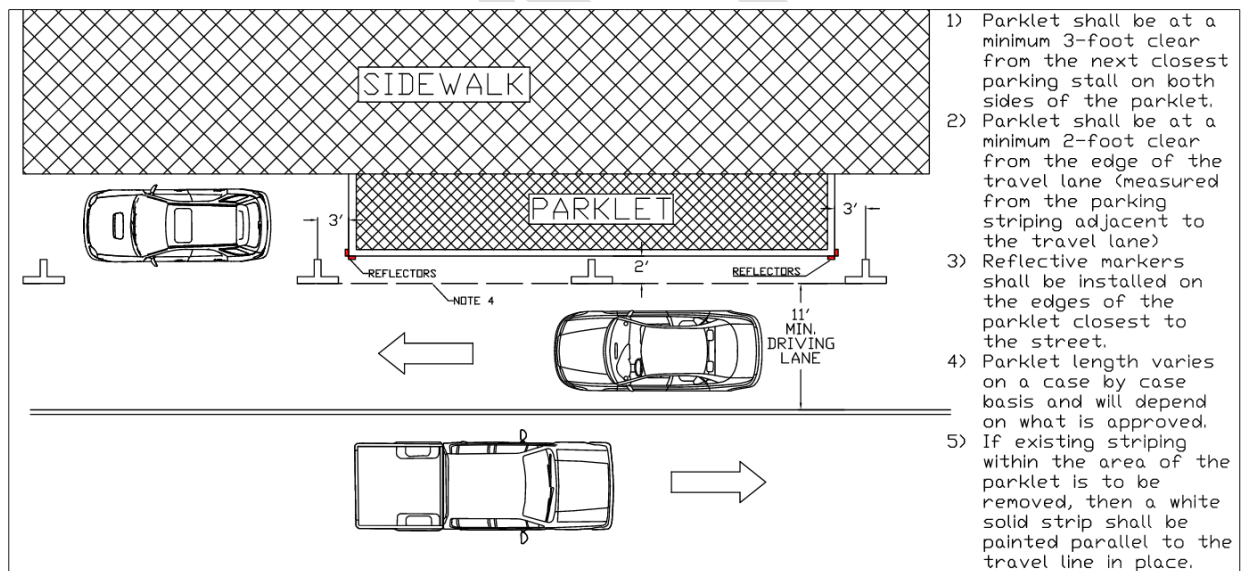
Example of Parklet Placement in Parallel Parking Stalls
